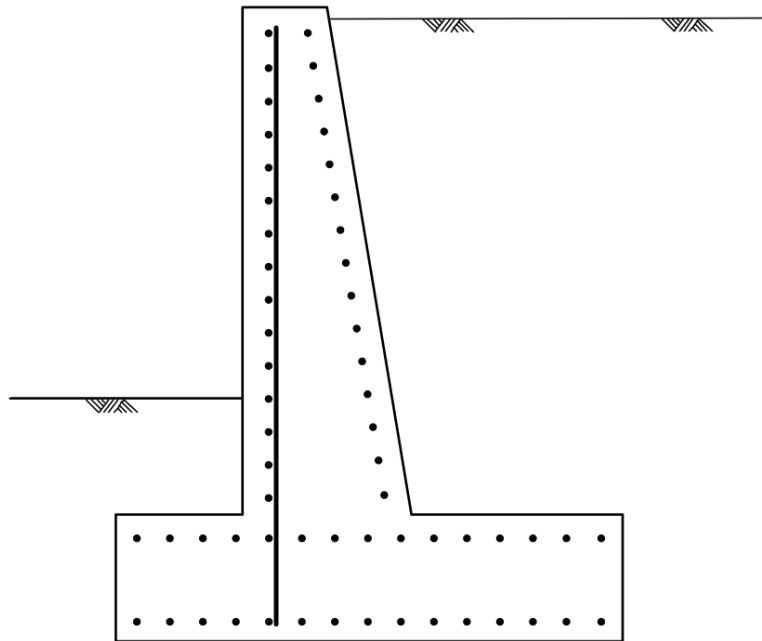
Secondary Reinforcement in Concrete Cantilever Wingwall
